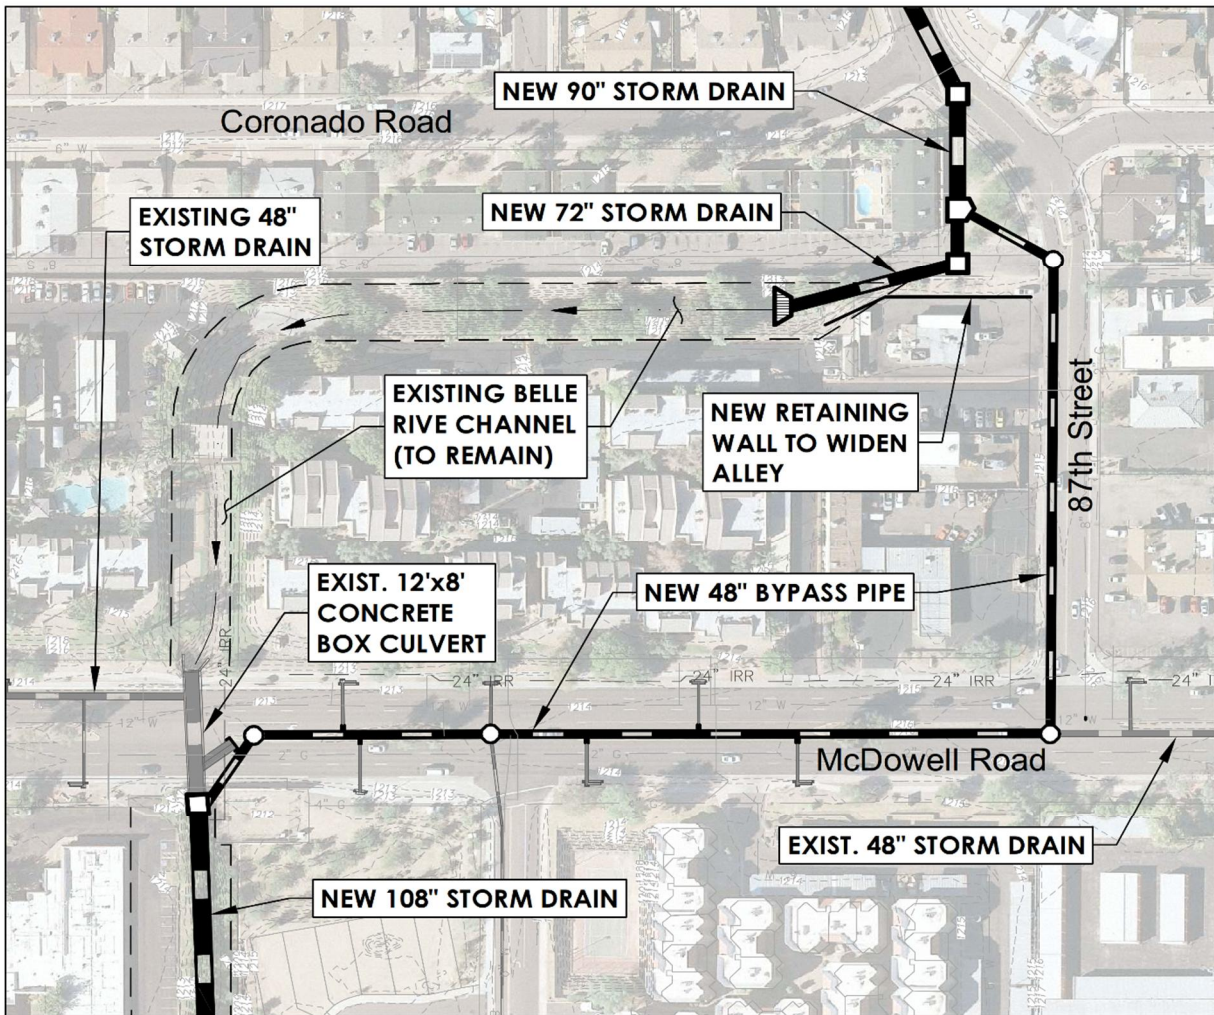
87th Street Low-Flow Bypass Storm Drain and Alley Widening
